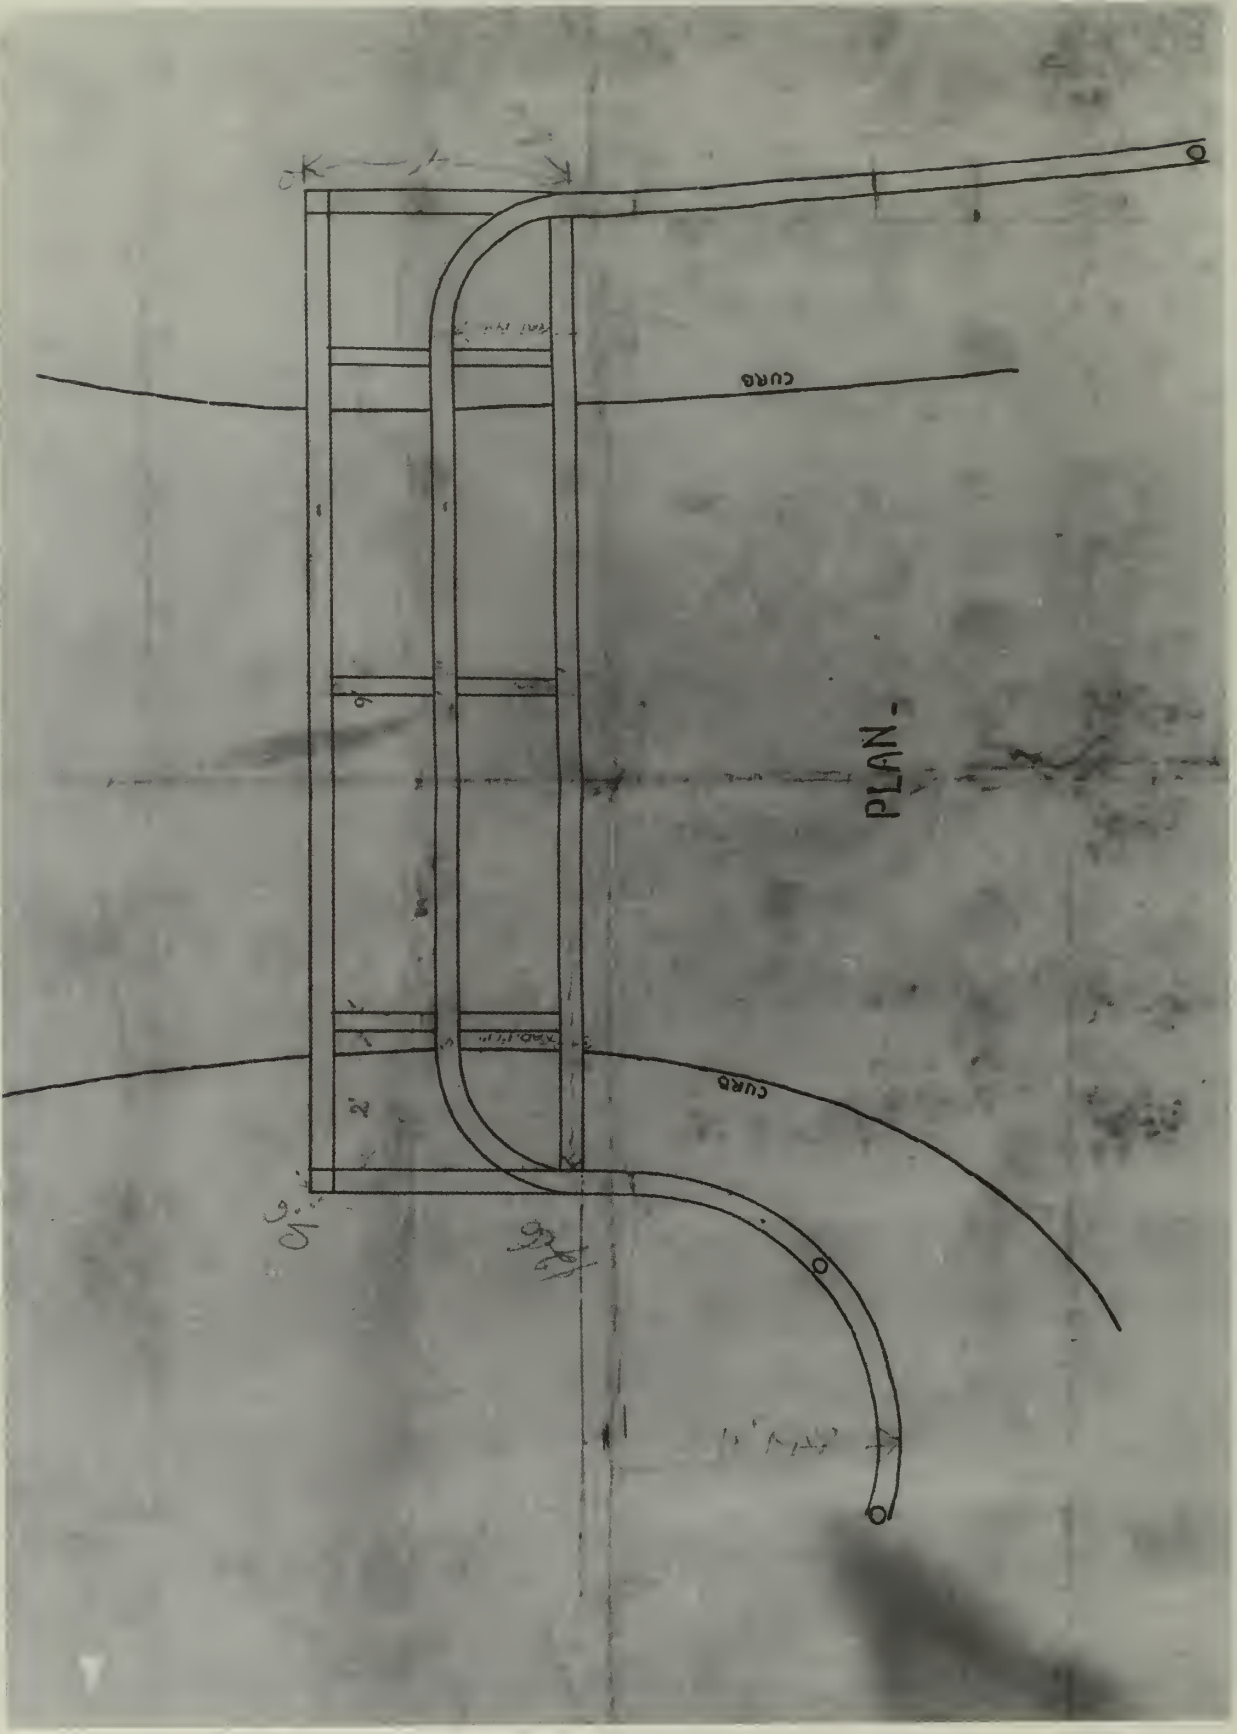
Spruce pole fence: plan of front driveway arch, circa 1883.
